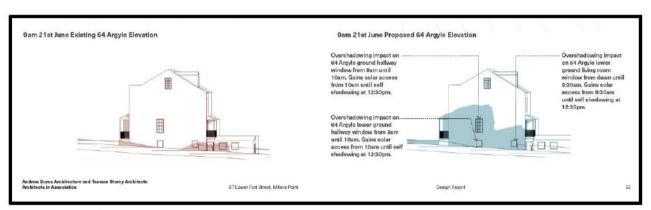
View towards 64 Argyle Pl. (Source: Andrew Burns Architecture)
